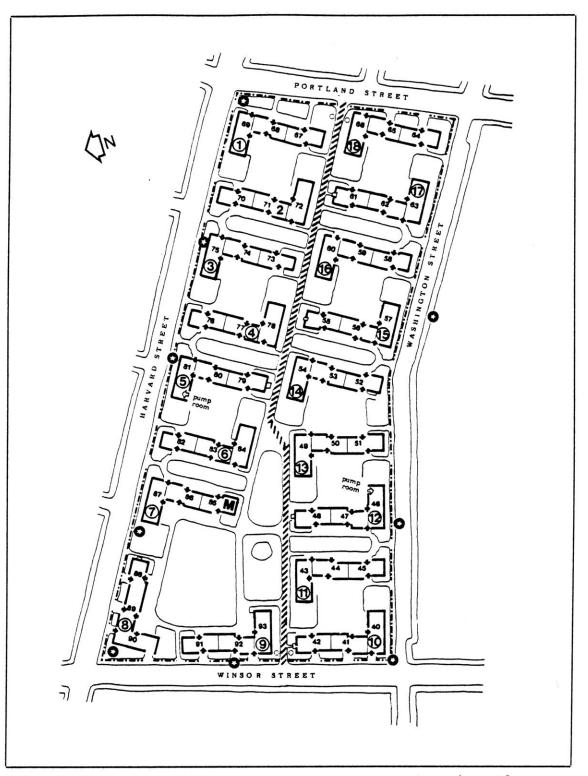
Washington Elms (Mass. 3-1), Site Plan. (Source: Cambridge Housing Authority.)
